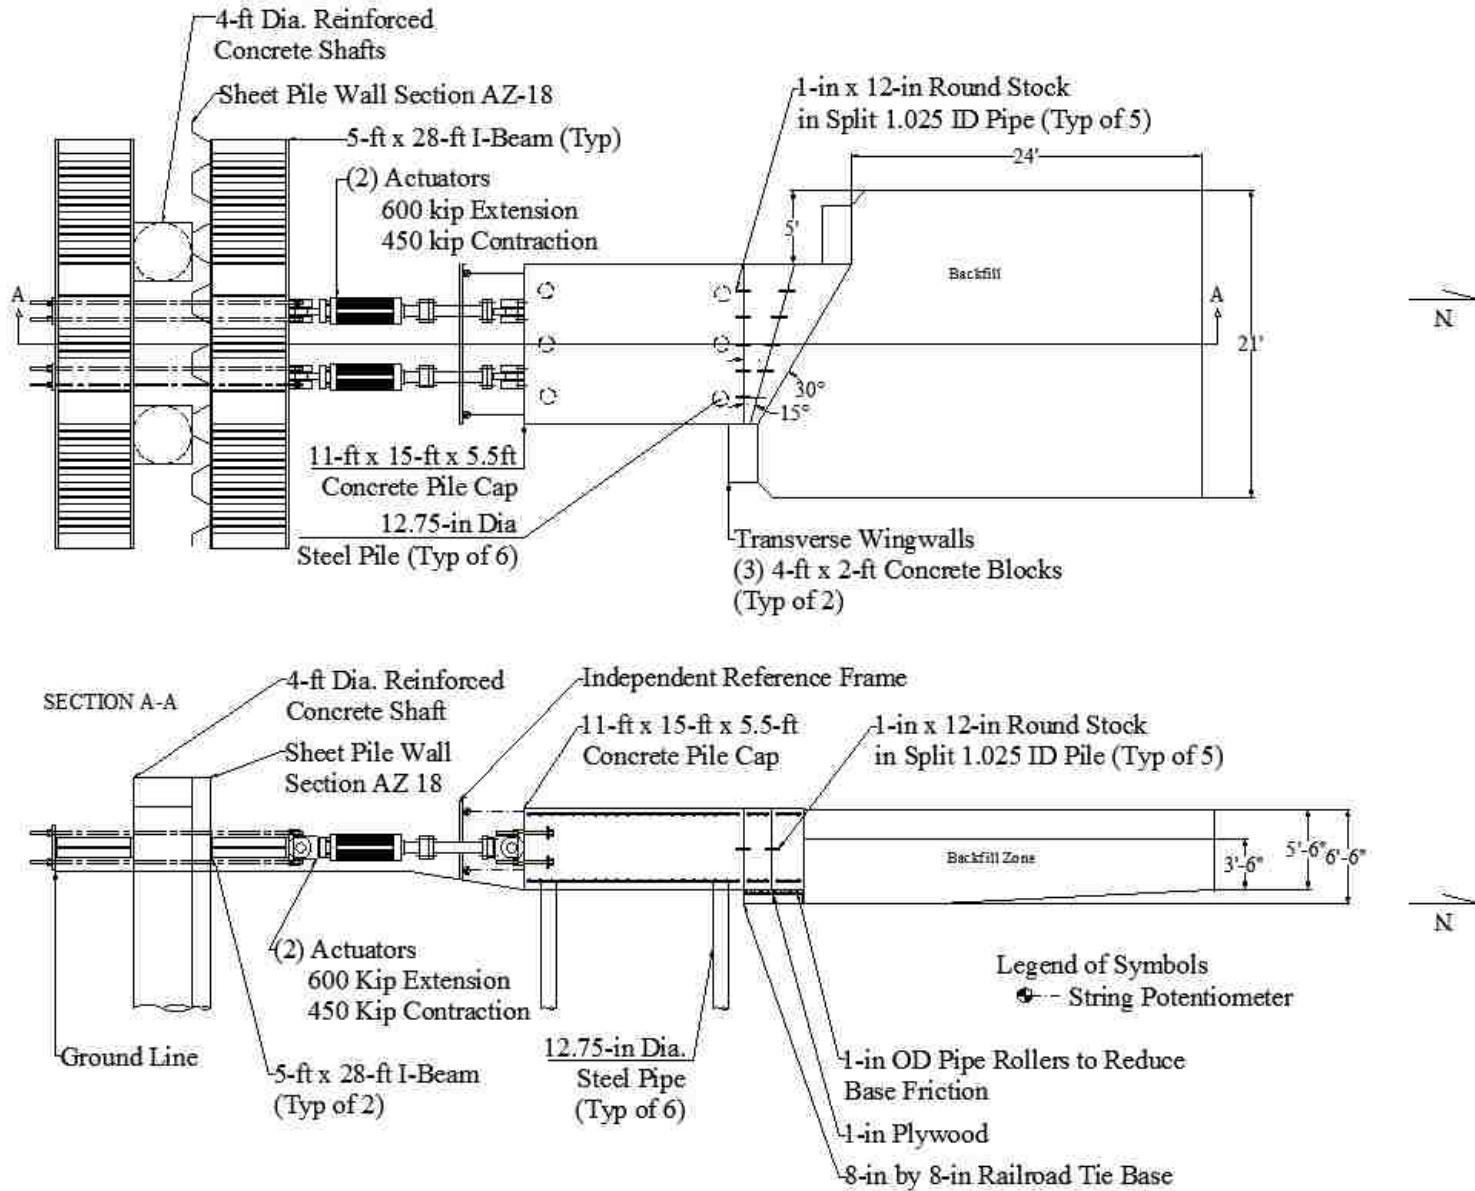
Schematic plan and profile drawings of field layout for gravel tests (NOTE 1 ft = 0.305 m).
